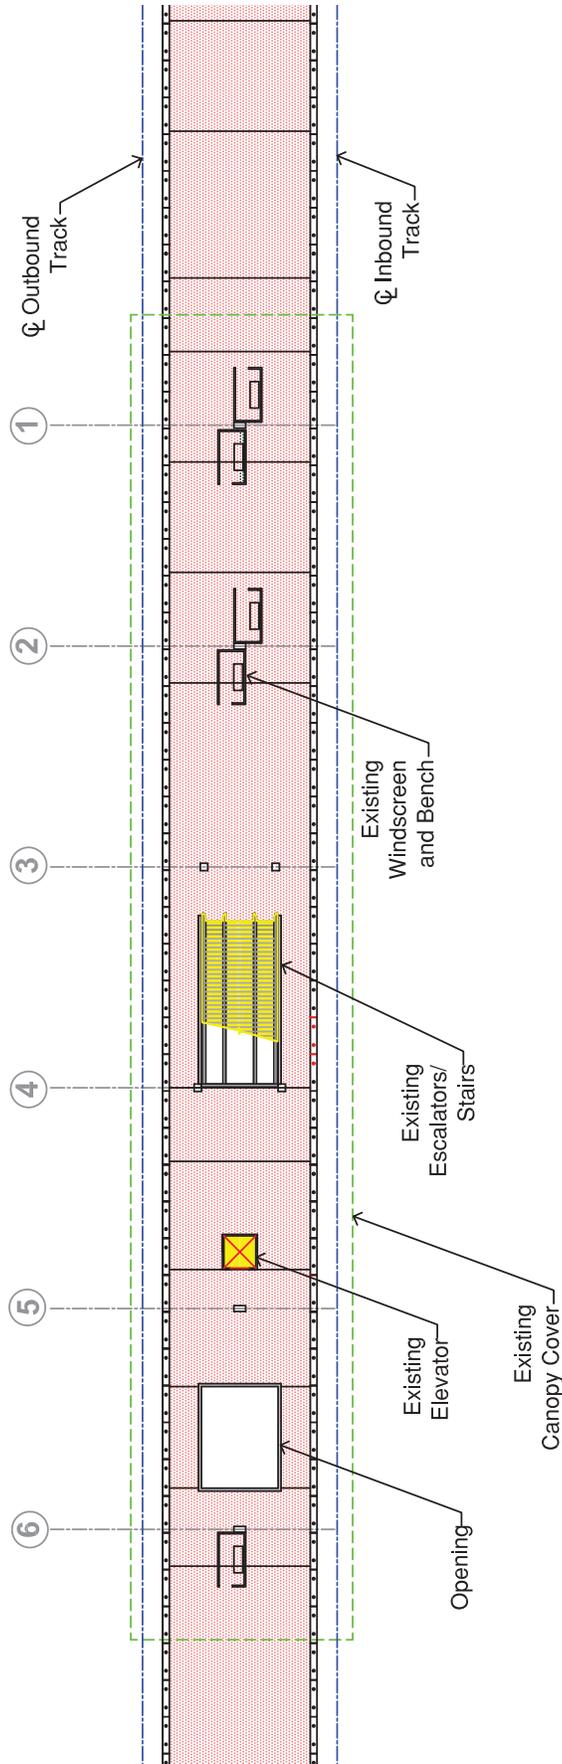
Existing Conditions - Partial Platform Plan (NTS)
